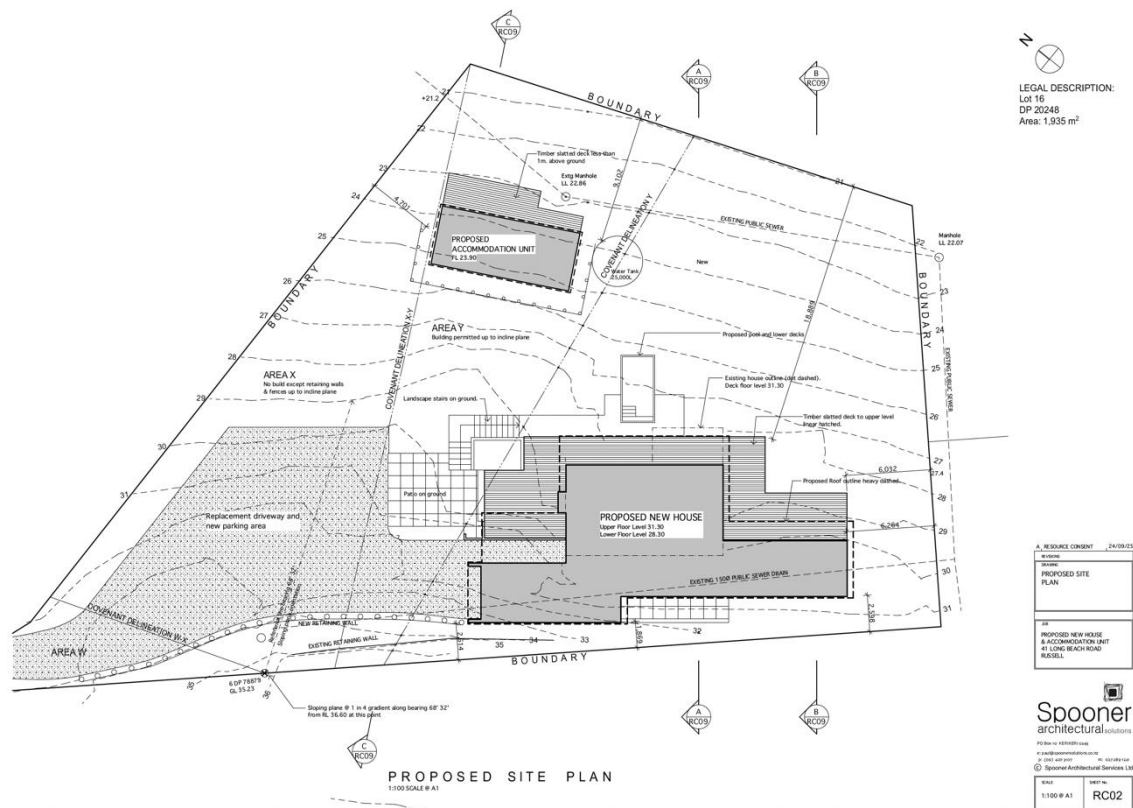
Proposed site plan (Prepared by Spooner Architectural Services)
